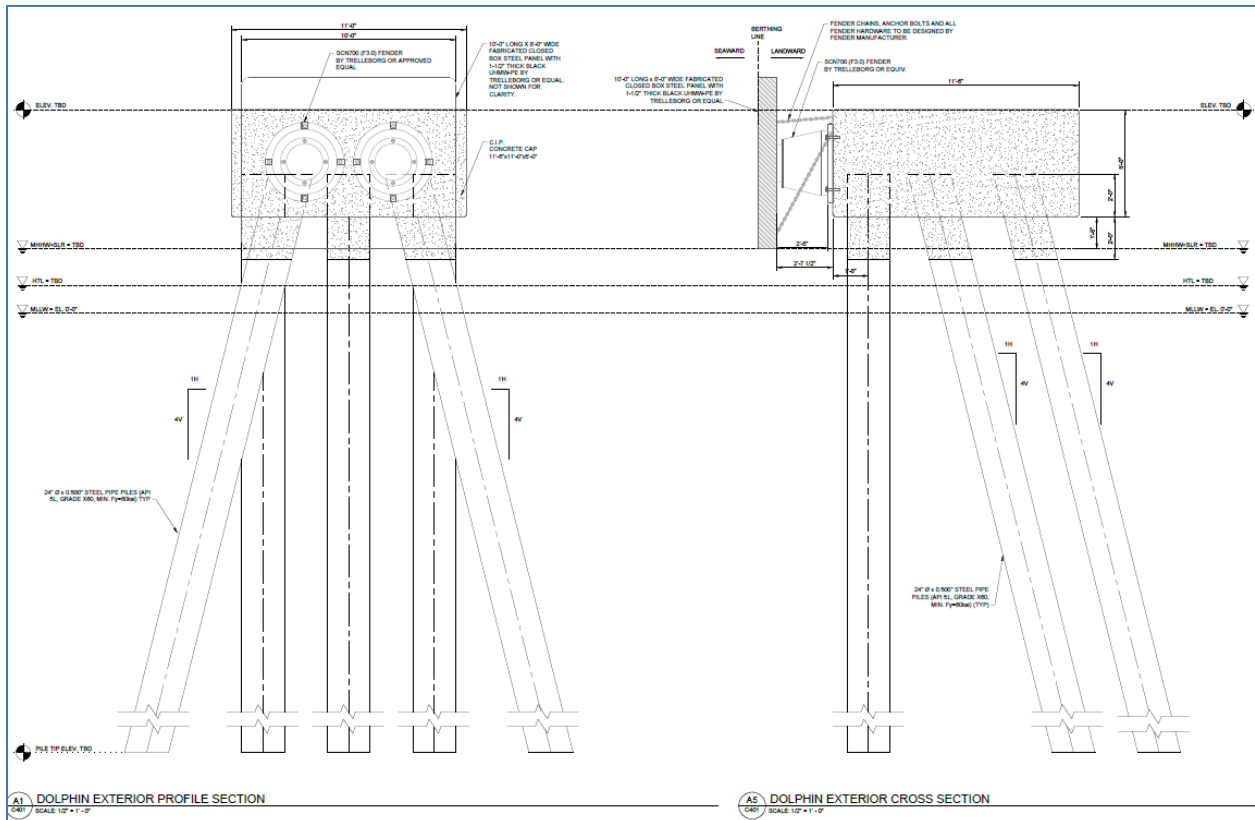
Concrete Dolphin Exterior Sections from Tetra Tech Drawing C401 Sheet 8 of 9, 2024
